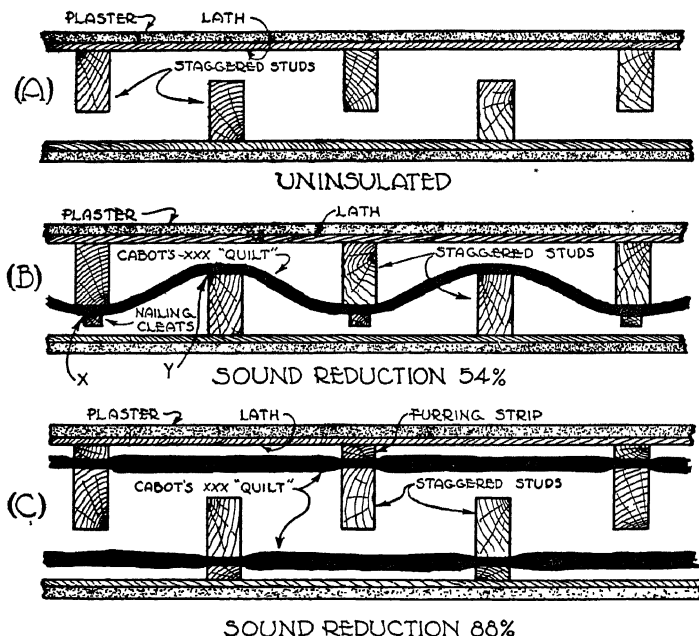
Sections of Wall Showing Two Methods of Sound Insulation
